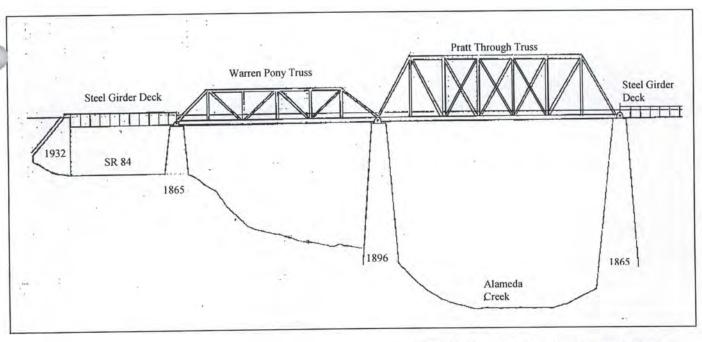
Farwell bridge construction dates and types. Illustration by author. (Not to scale)
